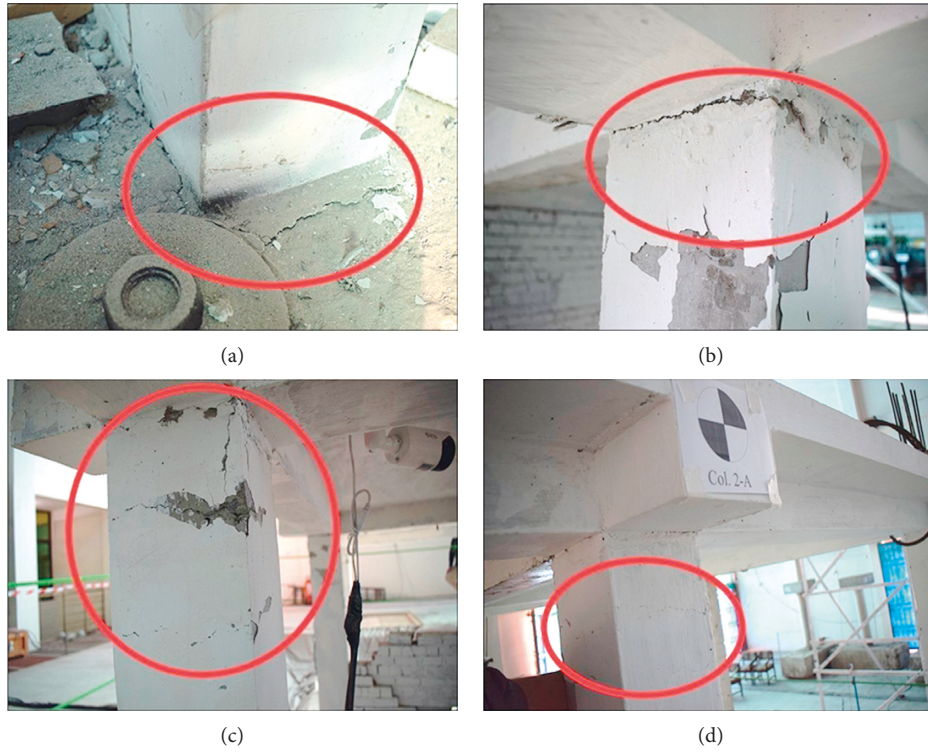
Damage observations of URM walls after Test Run-3. (a) Pulling out of column from foundation. (b) Flexural cracking at top end of first storey. (c) Level of cracking and spalling (1st storey). (d) Level of cracking (2nd storey).
